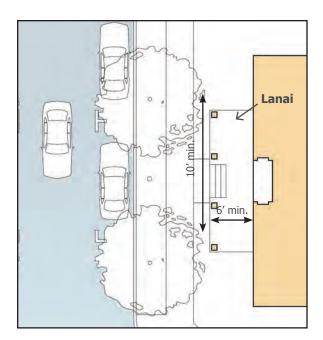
Plan View, Lanai and Yard Frontage (Illustrative)
